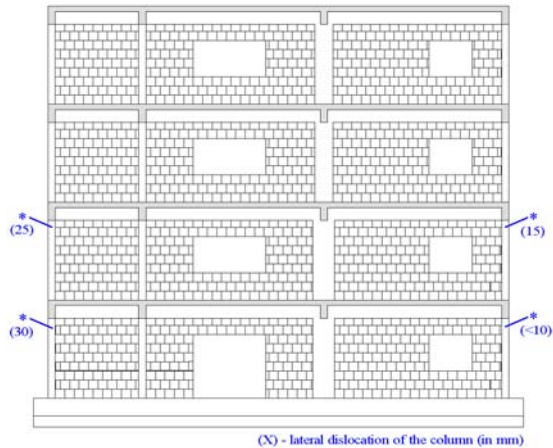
Frame A (brick infilled frame): damaged joints after the PsD tests
